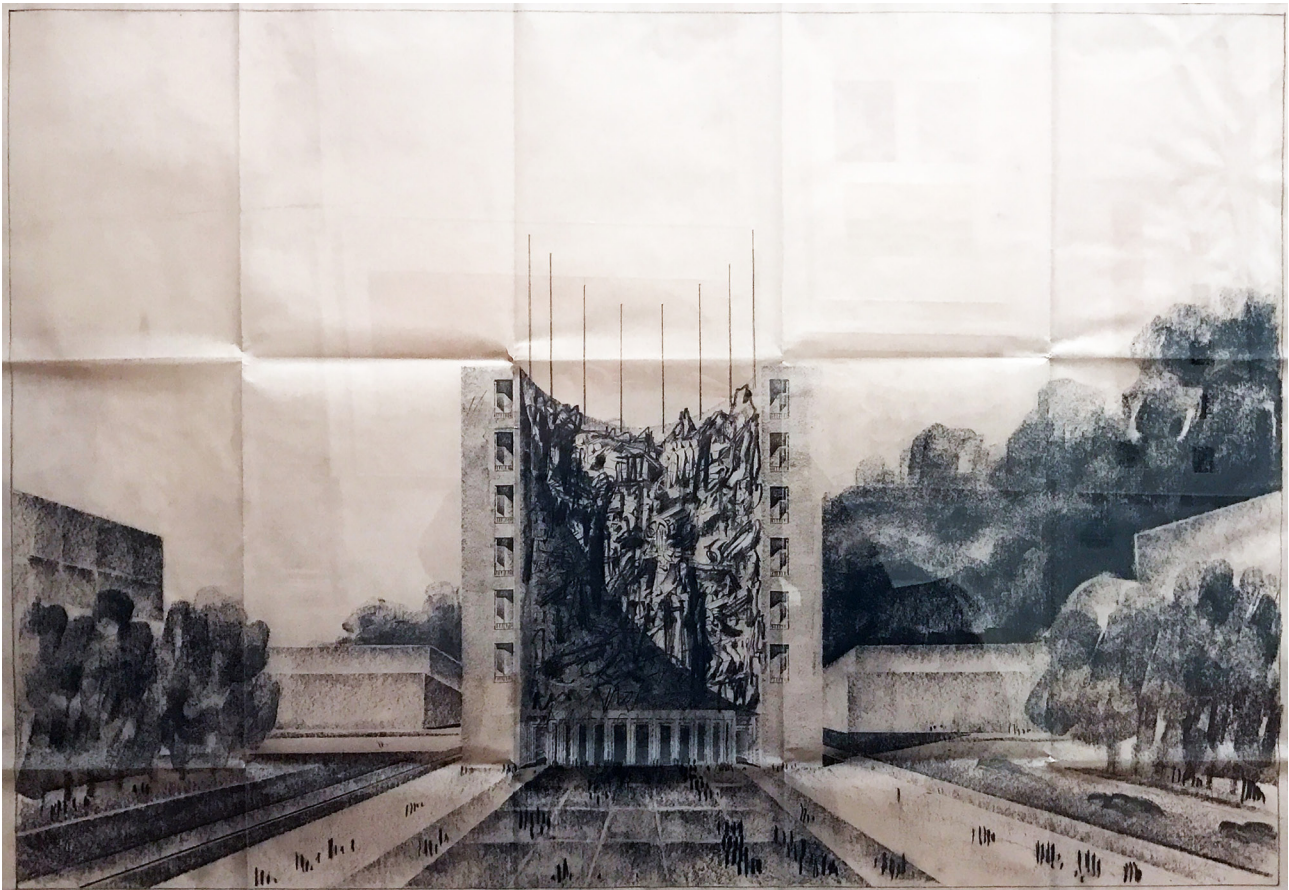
Gio Ponti, 1938. Perspective view of the Acqua e della Luce building, Rome [CSAC Parma, Project Section, Gio Ponti Fund] (photo by the author).
